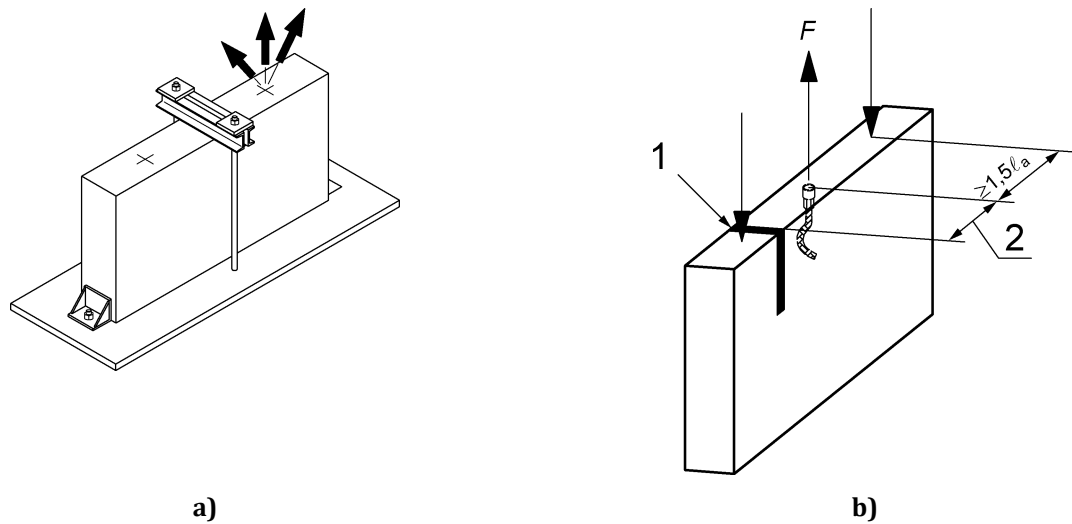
Example of a test set-up for inserts under tension load and combined tension and shear load
